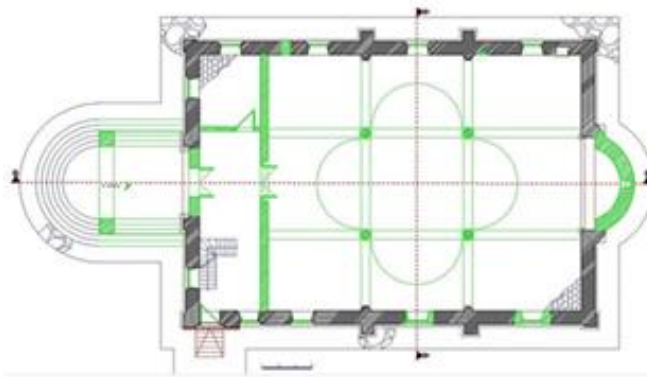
Armenian Protestant Church Ground Floor Plan Restitution (Öztürk, 2022)
